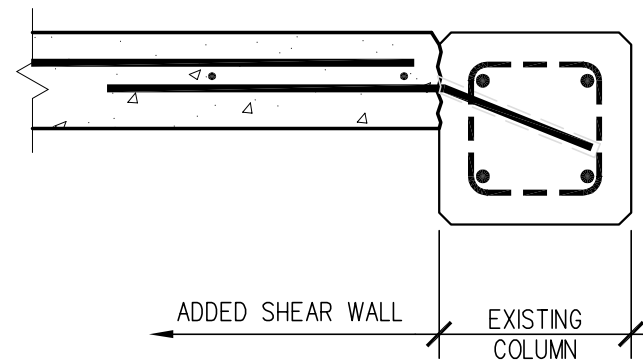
E: NEW SHEAR WALL AT EXIST. COL.
